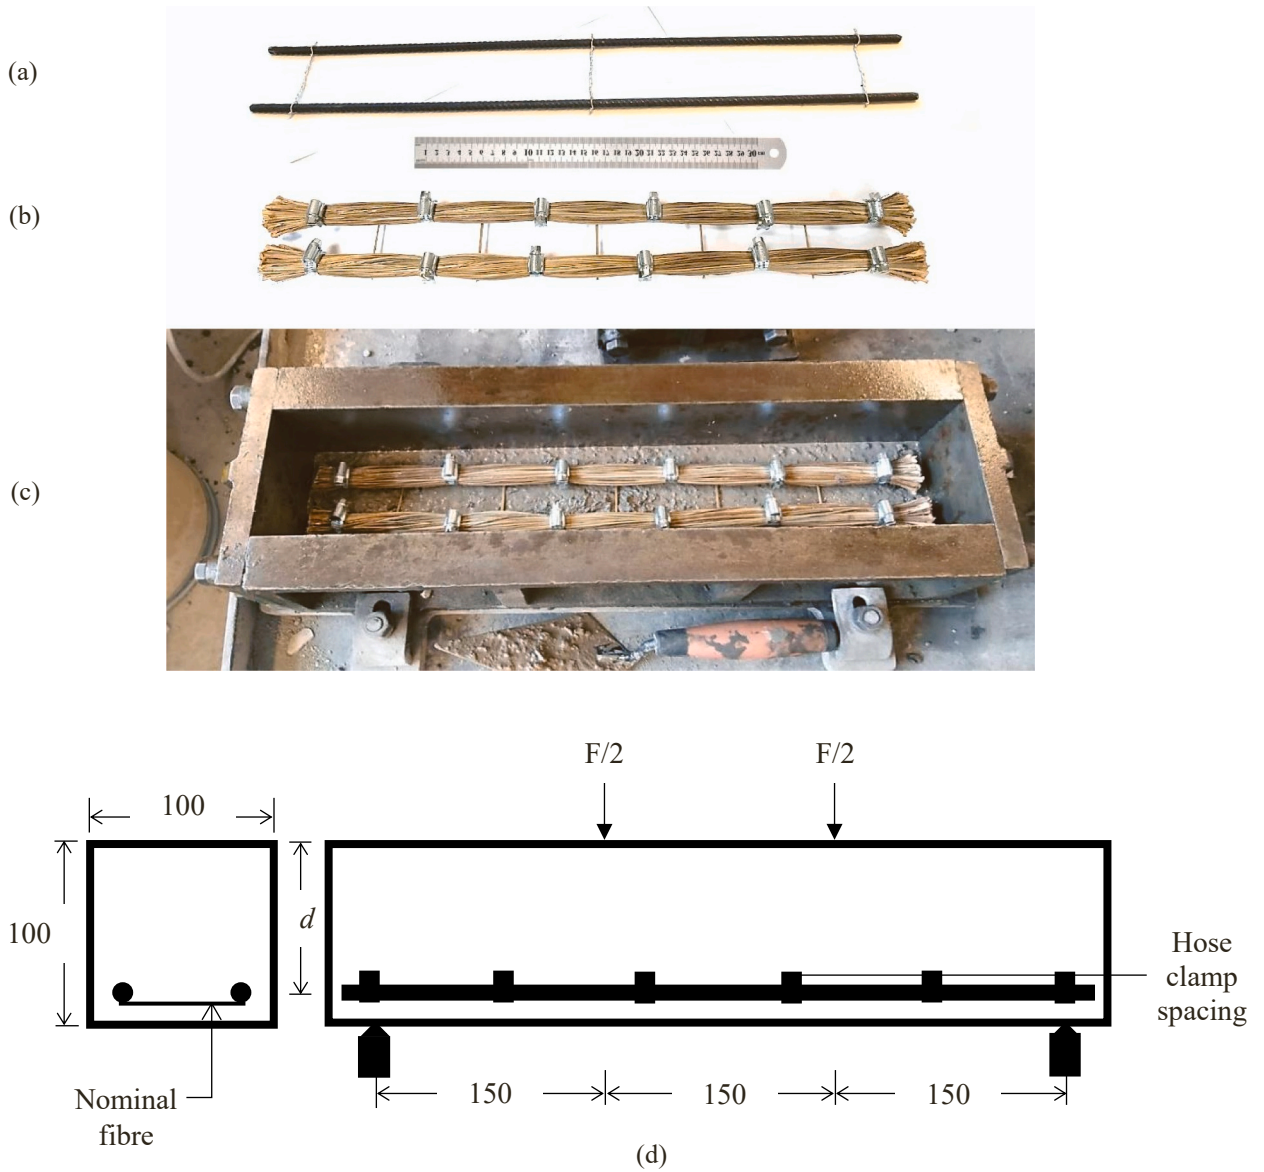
(a) 6 mm Ø steel reinforcement (b) a 120 F-85 s OPBF-strand reinforcement (c) OPBF reinforcement placed in 100 × 100 x 500 mm mould (d) cross-section and longitudinal section of sample.
